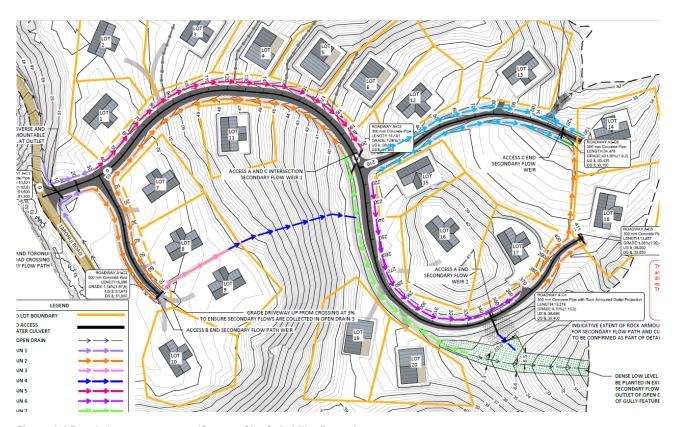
Papakāinga accessways (Source: Site Suitability Report)
